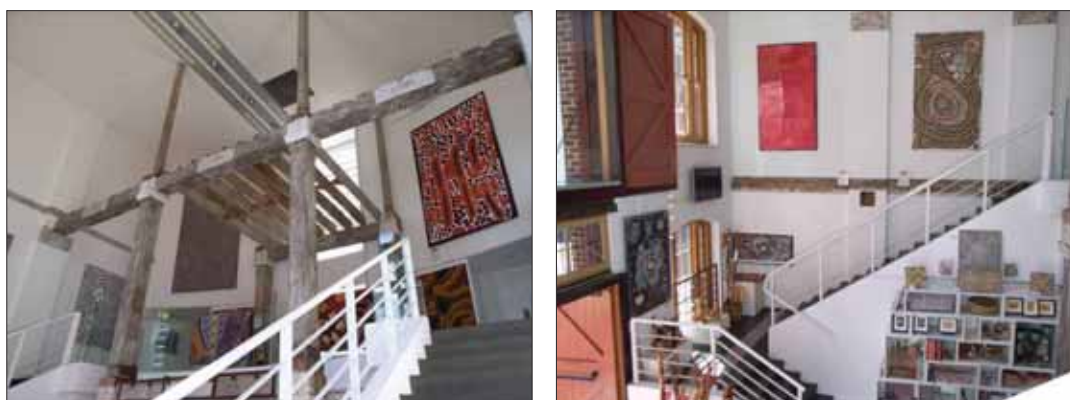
General views of western portion of Bay 5, Aboriginal art gallery. Note the retained timber structure with painted numberings, exposed brick floor levels and joist junctions.
